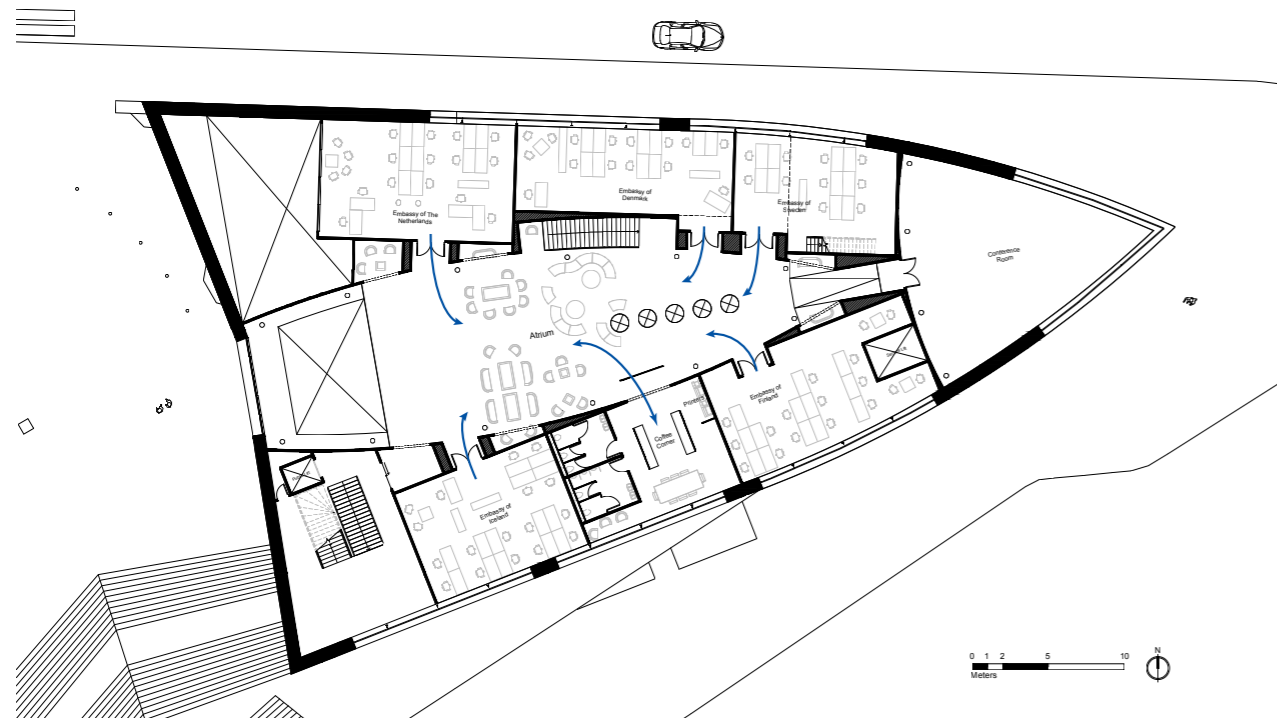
First floor of the embassy complex, showing the connection to the common space (atrium).
